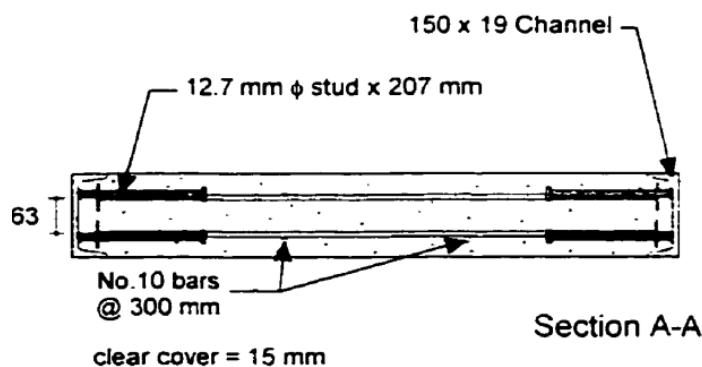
RC wall specimen with boundary elements of steel channel section
